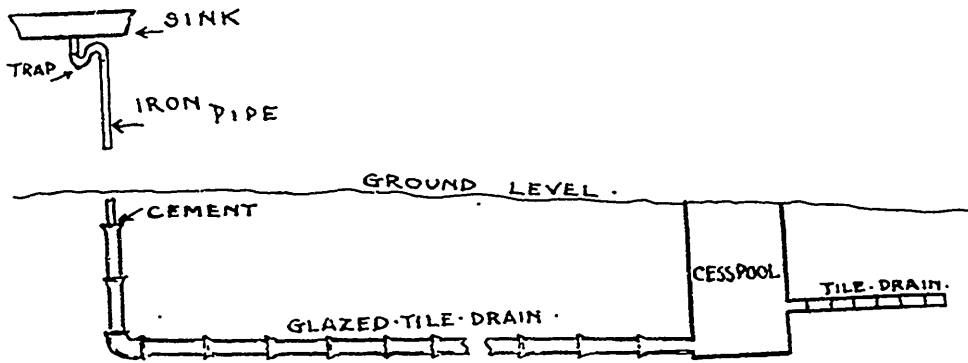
APPROVED PLAN OF KITCHEN DRAINAGE SYSTEM.
